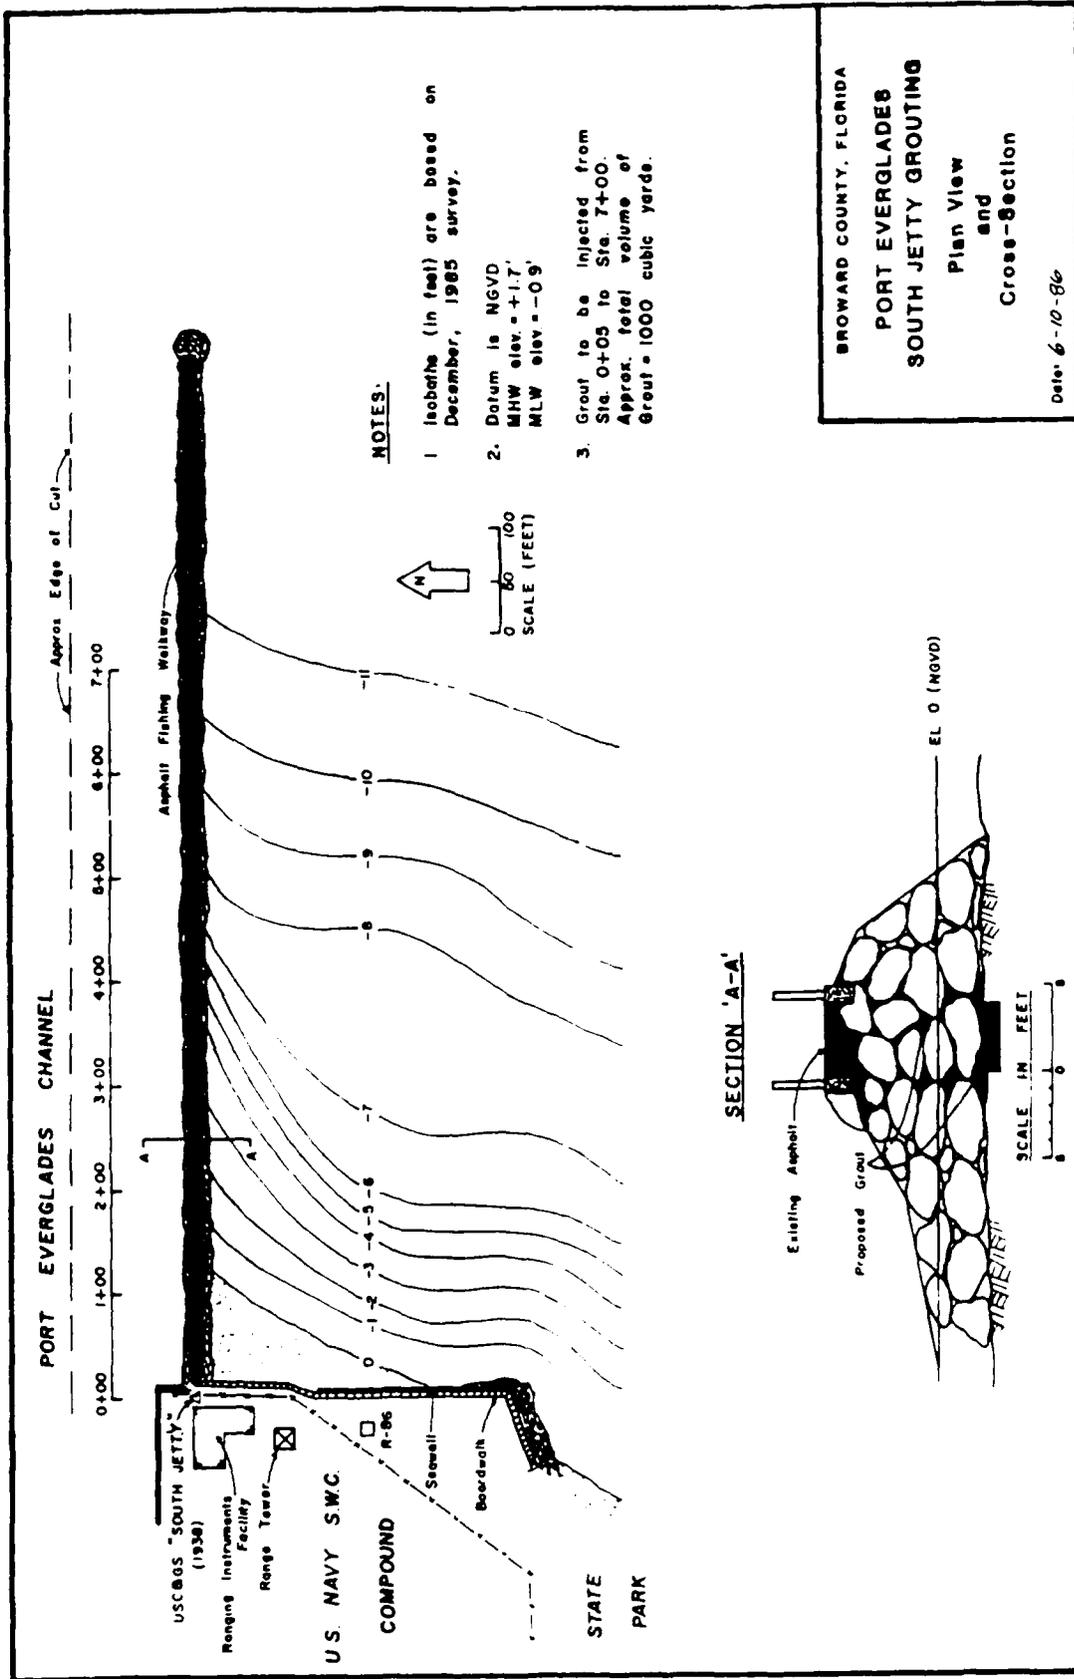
Plan view and cross section, Port Everglades, Florida, south jetty rehabilitation project (after BCEQCB, op. cit.)
